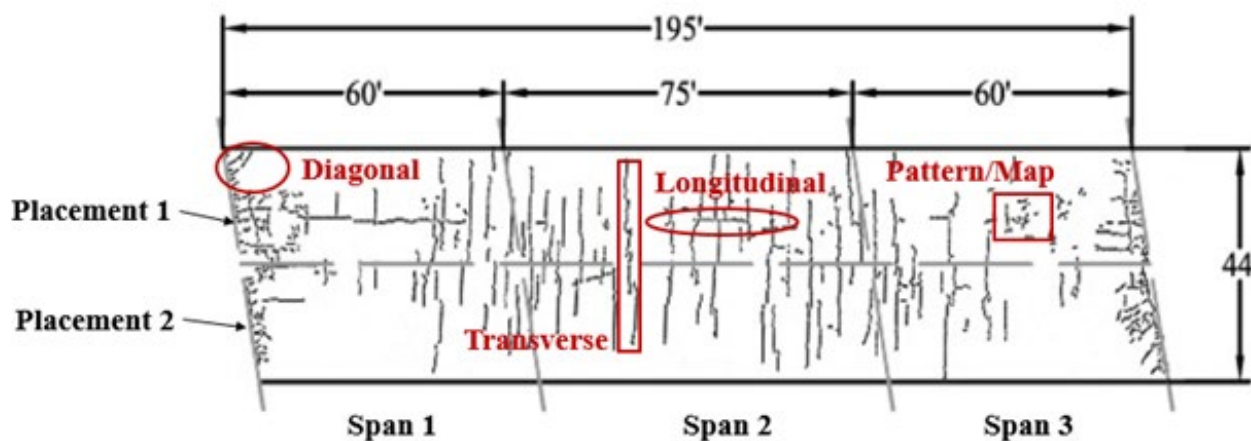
Bridge deck cracking patterns as shown on a crack map: Transverse, Longitudinal, Diagonal, and Pattern/Map (Darwin et al. 2004)
